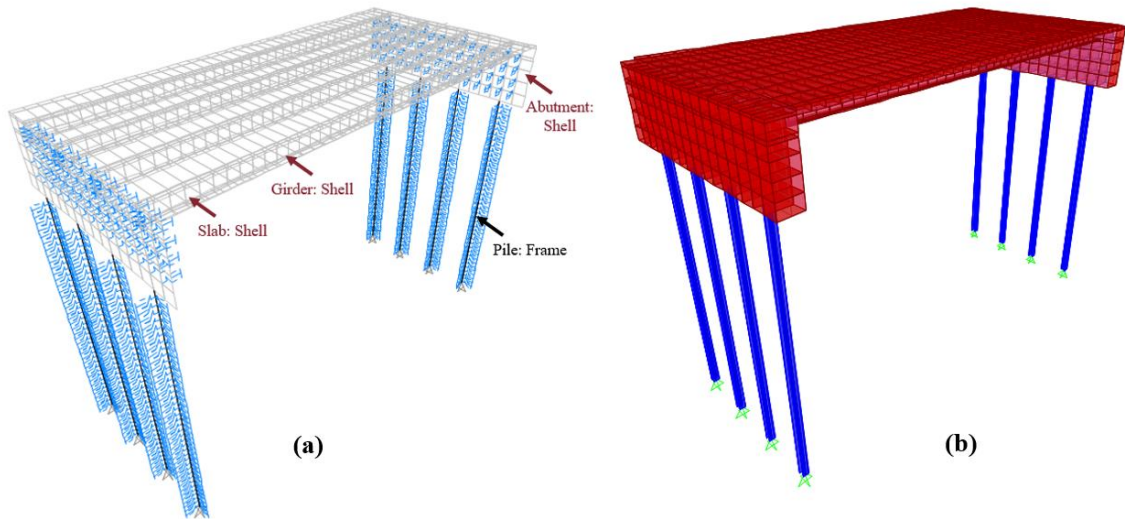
FEMs of Typical Steel Girder IABs in (a)Element View and (b)Extruded View
